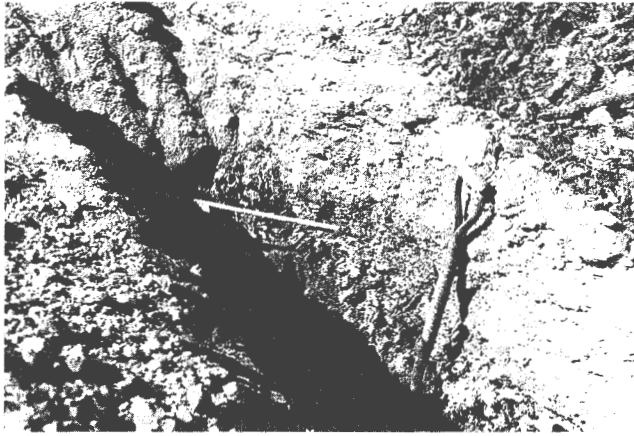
Base consisted of 20 to 22 in. of dirty gravel over ± 8 in. of compacted tire chips; gravel was dry, whereas silty sand subgrade contained enough moisture to hold together when squeezed.
